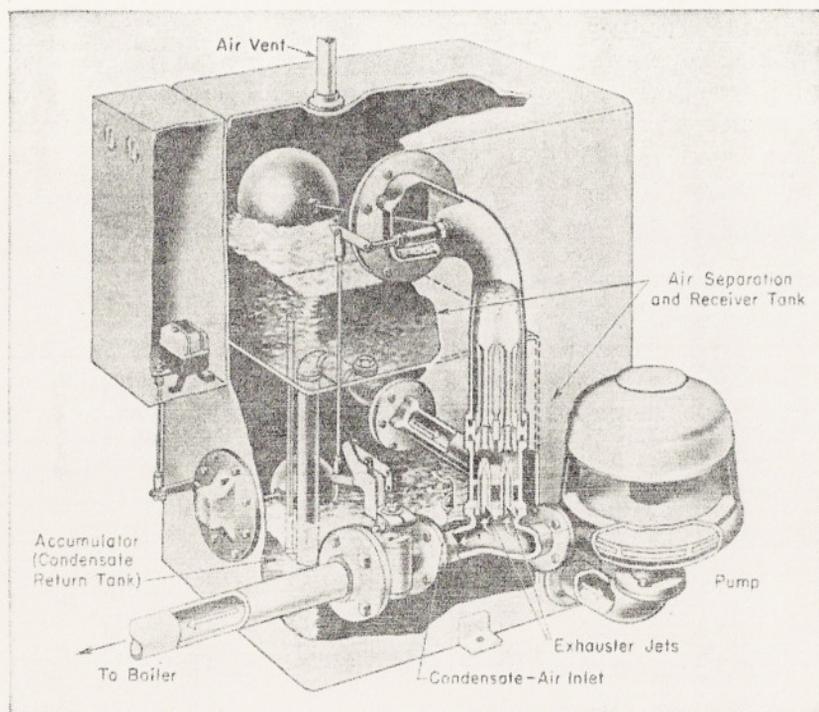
Vacuum pump and tanks for a vacuum steam system.
